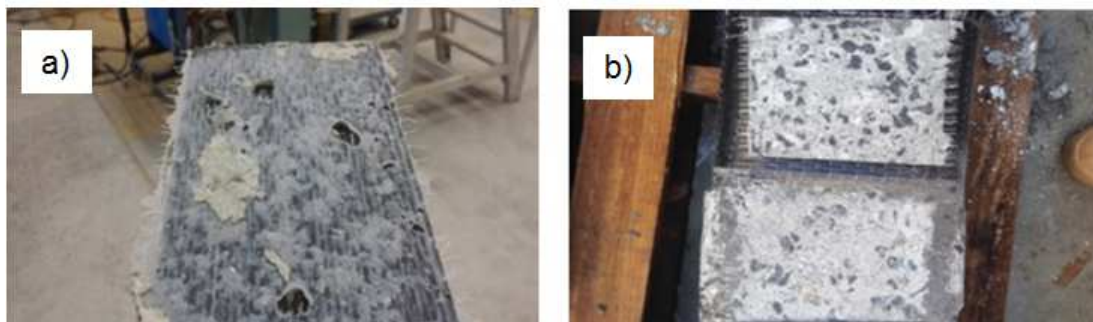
(a) Adhesive failure at BFRP/concrete interface of B330B, (b) Minimal damage to concrete substrate of B330B
